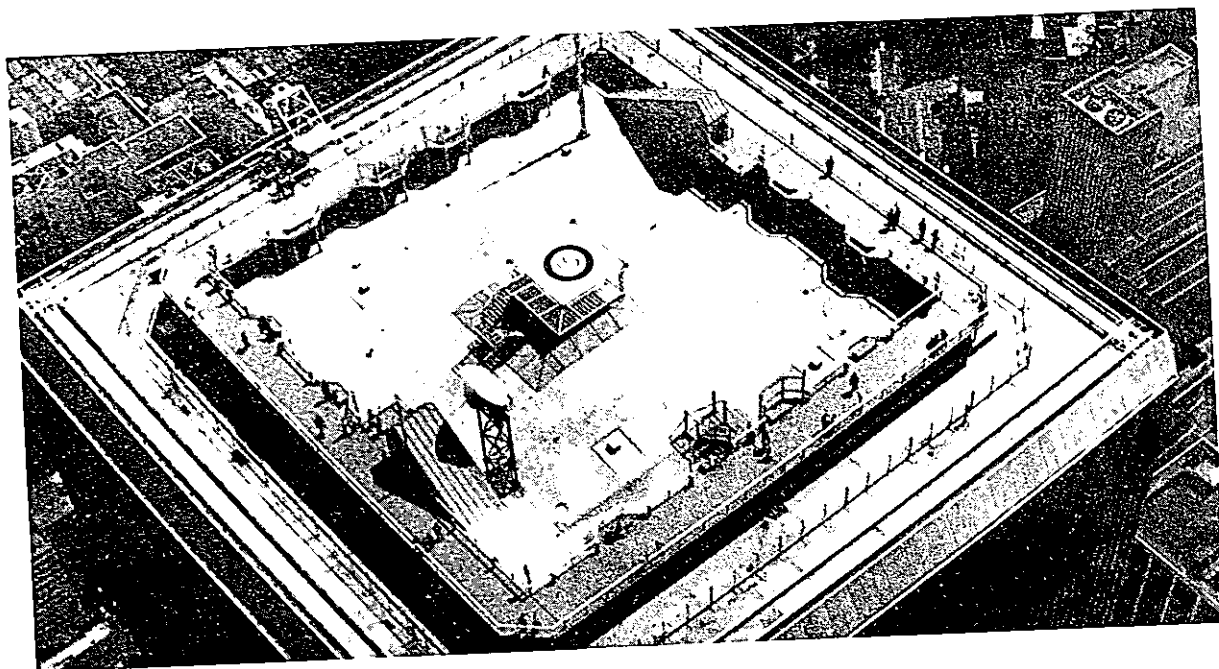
A ROOFTOP EMERGENCY-USE LANDING FACILITY
